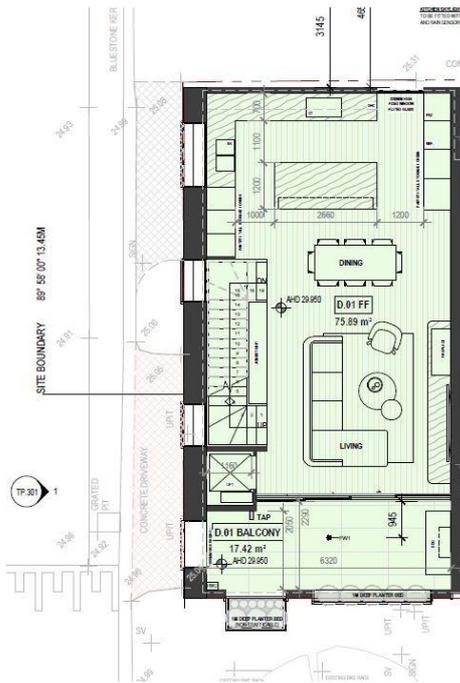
Plan of D.01 level 1. Stairs and lift programmed on north wall.
